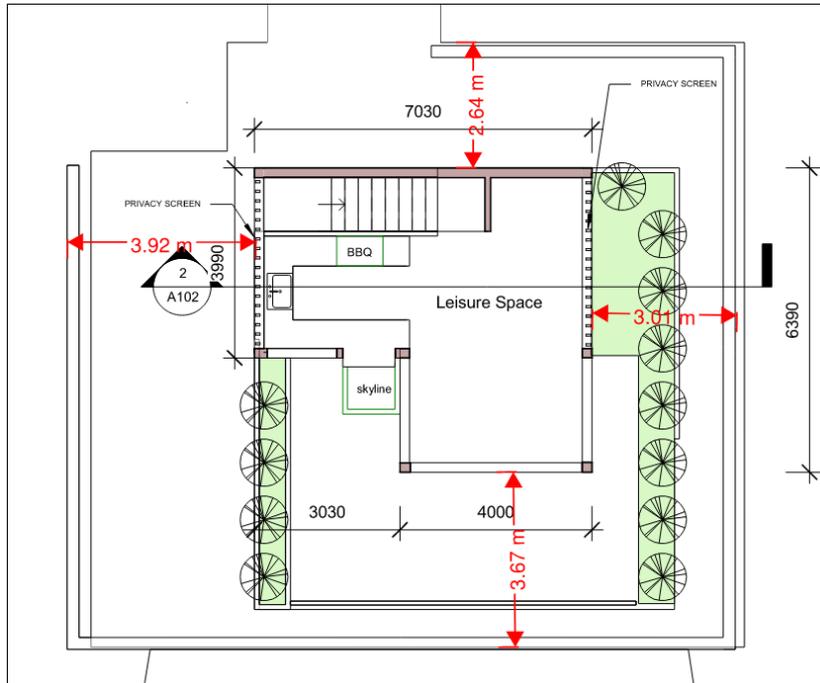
Proposed floor plan showing dimensions and setbacks to the building edge
